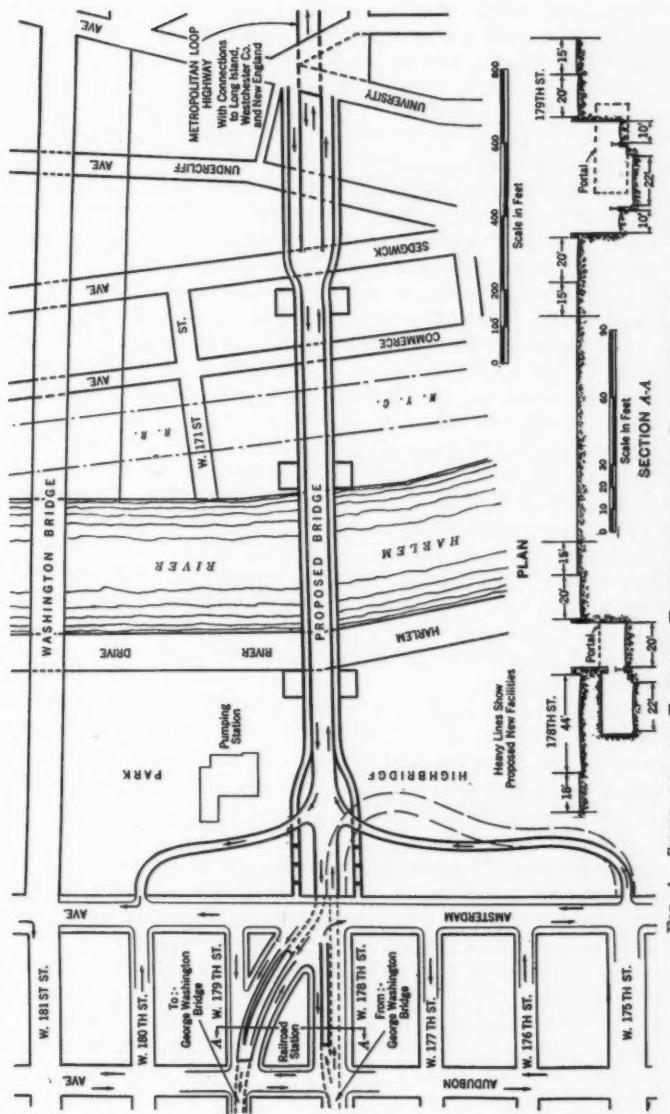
STUDY FOR AN EASTERN EXTENSION OF THE GEORGE WASHINGTON BRIDGE APPROACHES AS PART OF A METROPOLITAN LOOP HIGHWAY.
